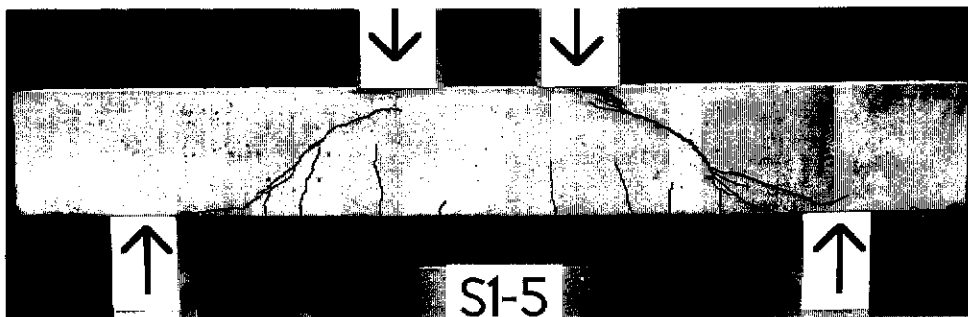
Crack Pattern of the Back Face of Beam S1-5
